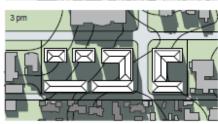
B.3 Shadow diagrams demonstrate the impact of overshadowing within and beyond the site
